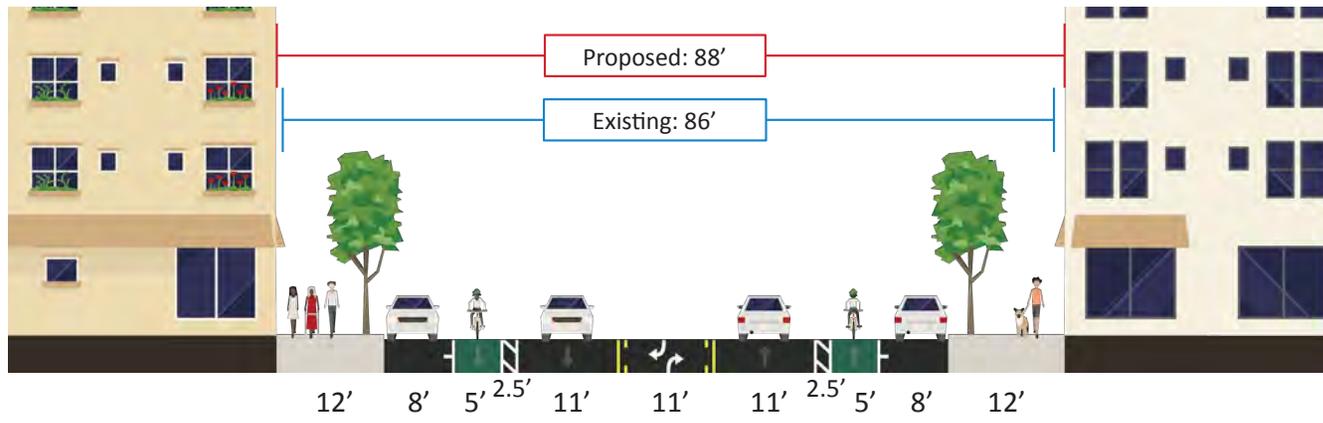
State Street- Proposed Hybrid Alternative Cross Sections
